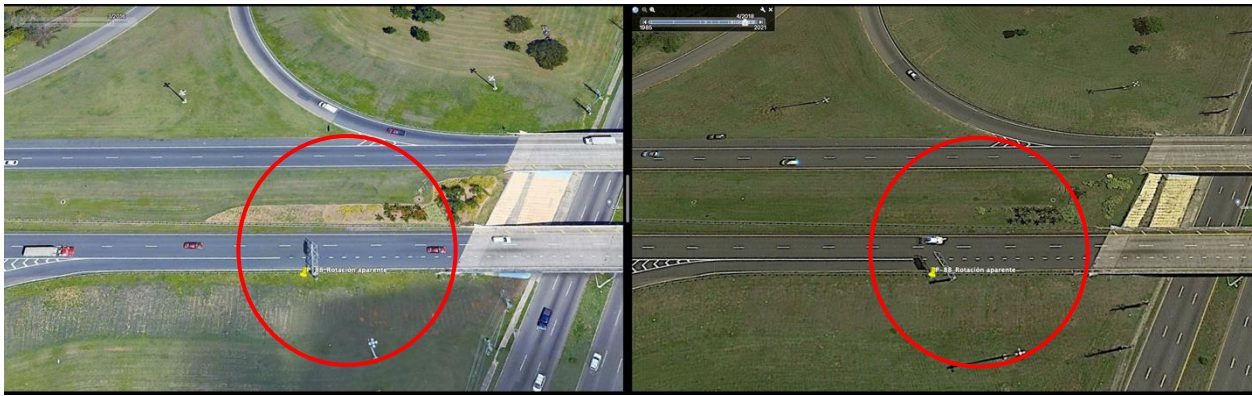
Photo of Cantilever Sign Soil Foundation Failure at P-88 Location: 18°27'13.01"N; 66°5'20.87"W (Photo 1 date: 3/2016, Photo 2 date: 4/2018)
